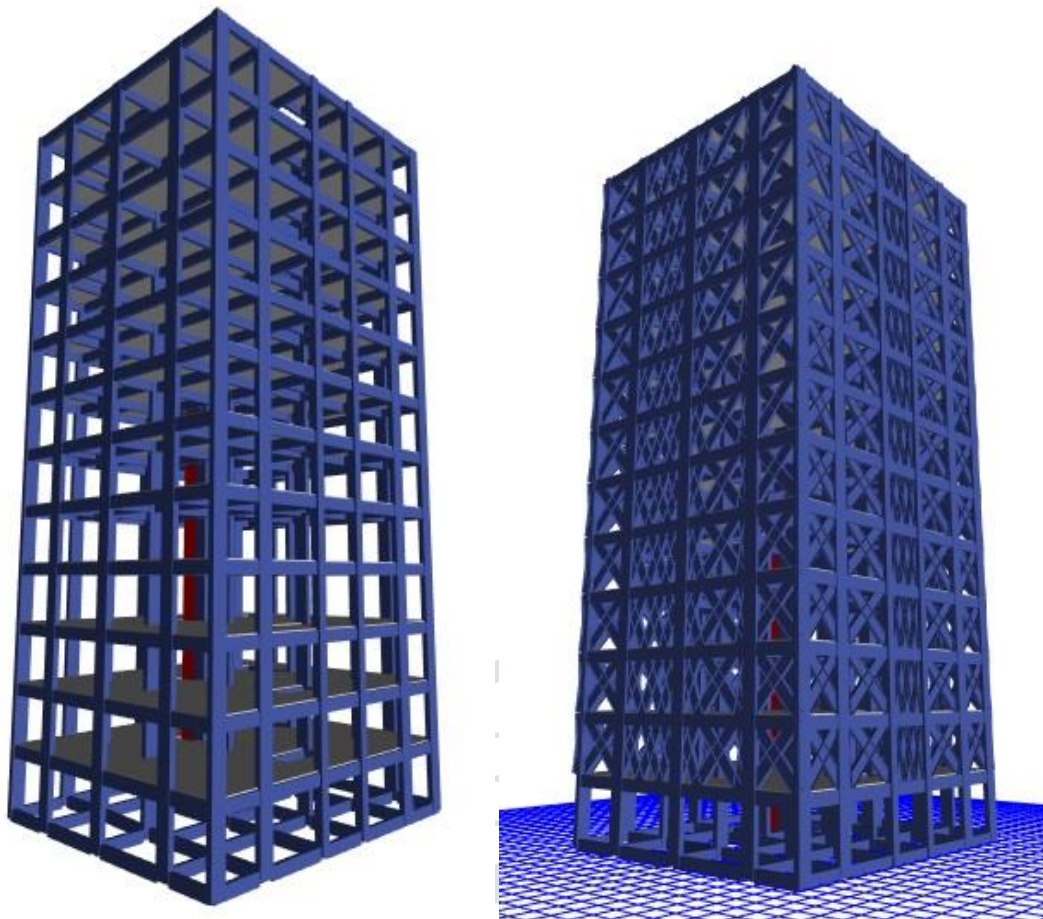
Symmetrical plan bare frame & equivalent diagonal strut model
